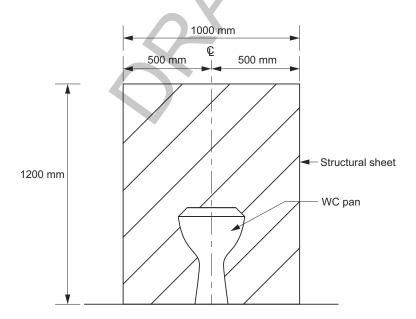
Location of sheeting for a wall behind a toilet pan
